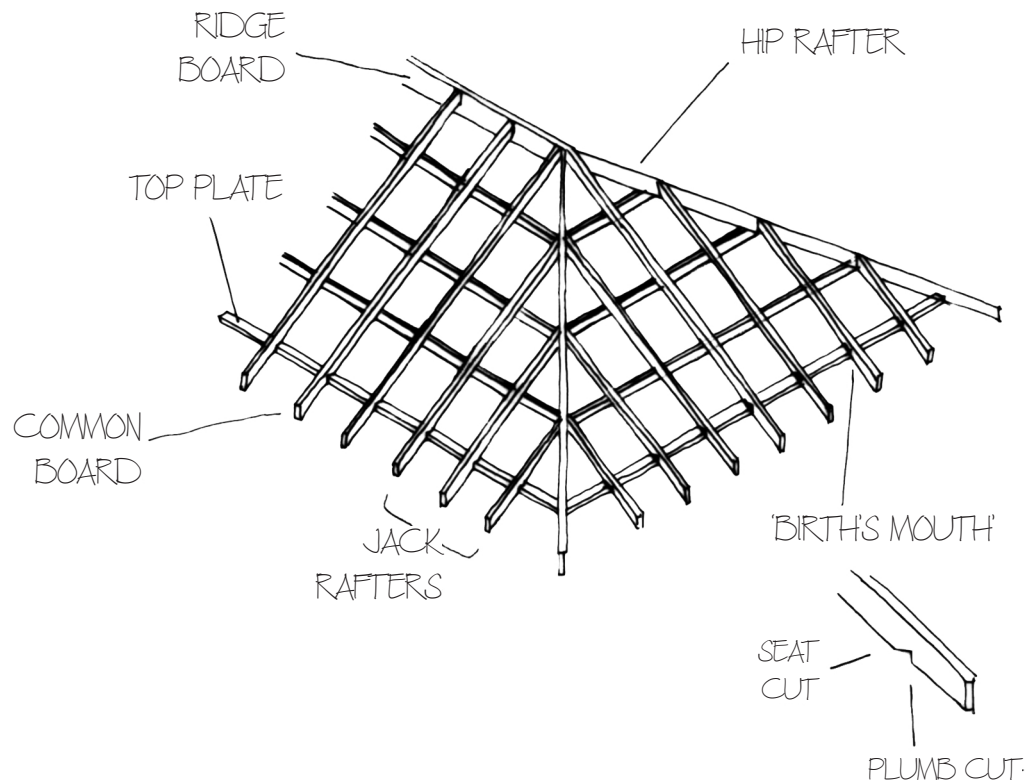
Typical roof construction 1940s-60s © Laura Feller adapted from (BRANZ Renovate.n.d.)
